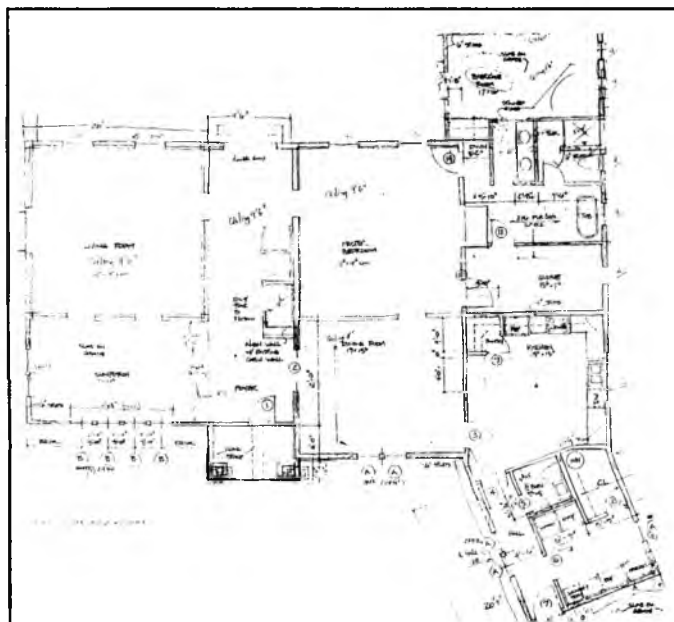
First floor plan of Cabaniss-Ezell House, late 1980s.
